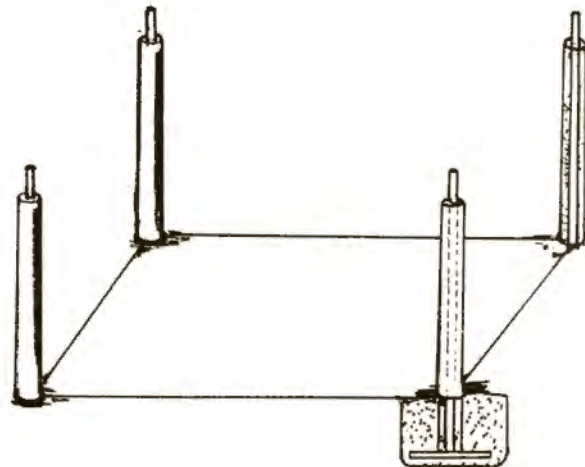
(c) Cement Concrete and steel bar in cement pipe
